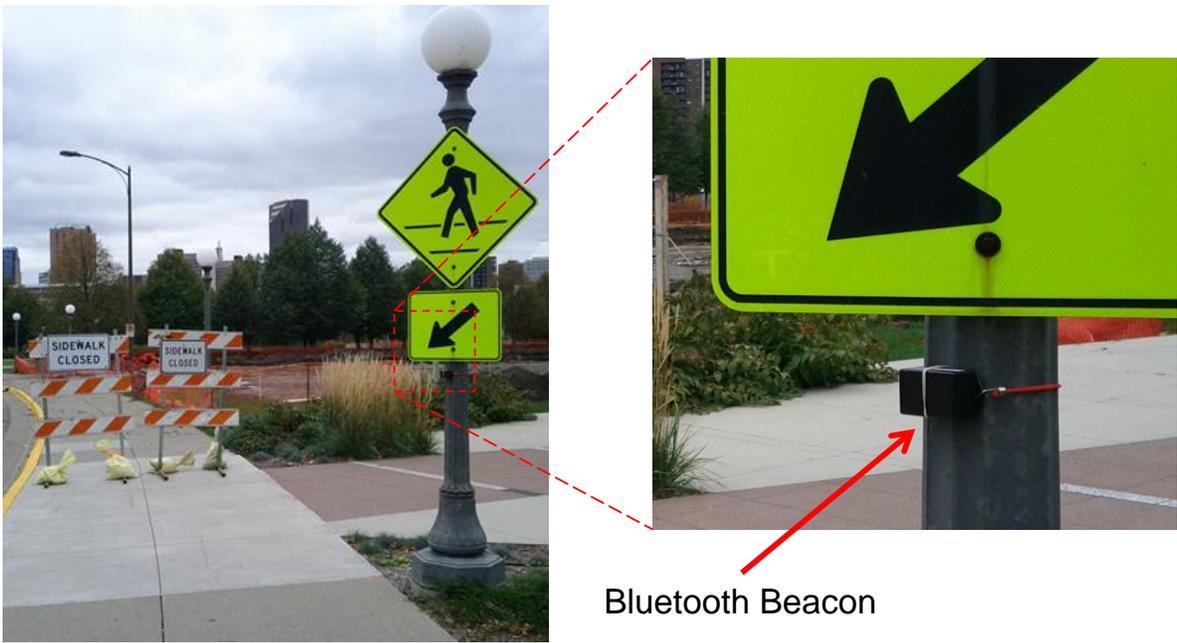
Installation of Bluetooth Beacon at Field Test Site (S. Sidewalk)
